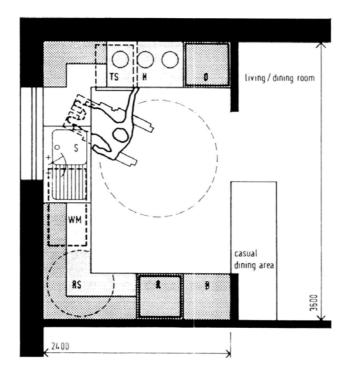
Kitchen layout to suit a wheelchair user (Scottish Development Department, 1979) (O – oven; H – hob; C – cooker; TS - trolley storage unit; B – broom cupboard; WM – washing machine; R – refrigerator; RS – rotating storage unit; S – sink).
